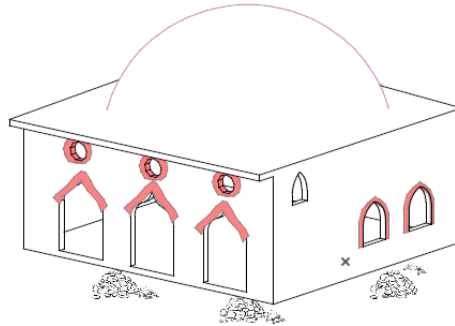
Schematic drawing of the damage (Damage occurring between vertical walls due to different material usage, insufficient connections, previous inadequate reinforcement interventions, or lack of maintenance, Crumbling or loss on corbels) (Developed by the author, 2026)
